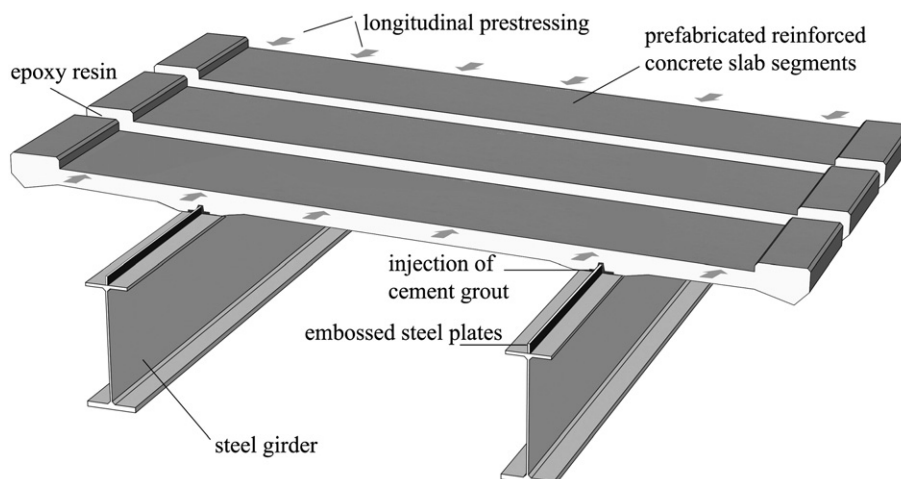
Typical cross section of a highway steel–concrete composite bridge realized with the connection by adhesion, interlocking and friction.
